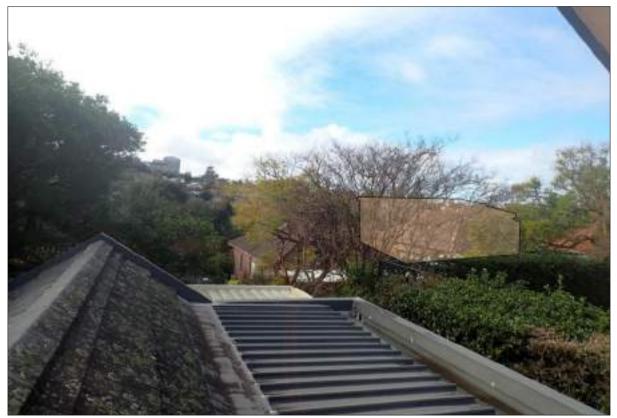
Submitted photomontage of proposed development as viewed from rear neighbour's (No.25 Balls Head Road) first floor bedroom.
